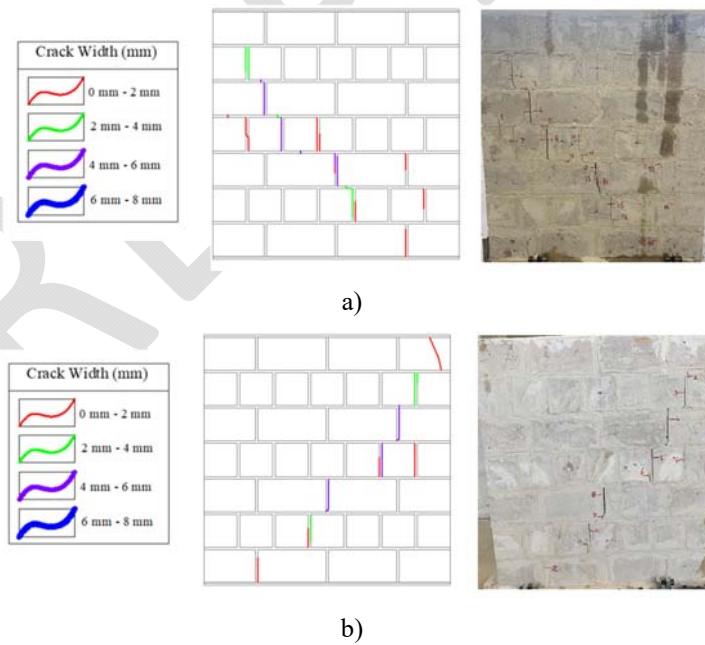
Crack patterns of G2 wall (a) front view, (b) back view [37]
